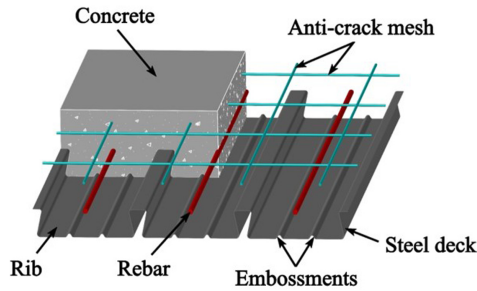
Composite slab with trapezoidal steel deck (adapted from [14]).
